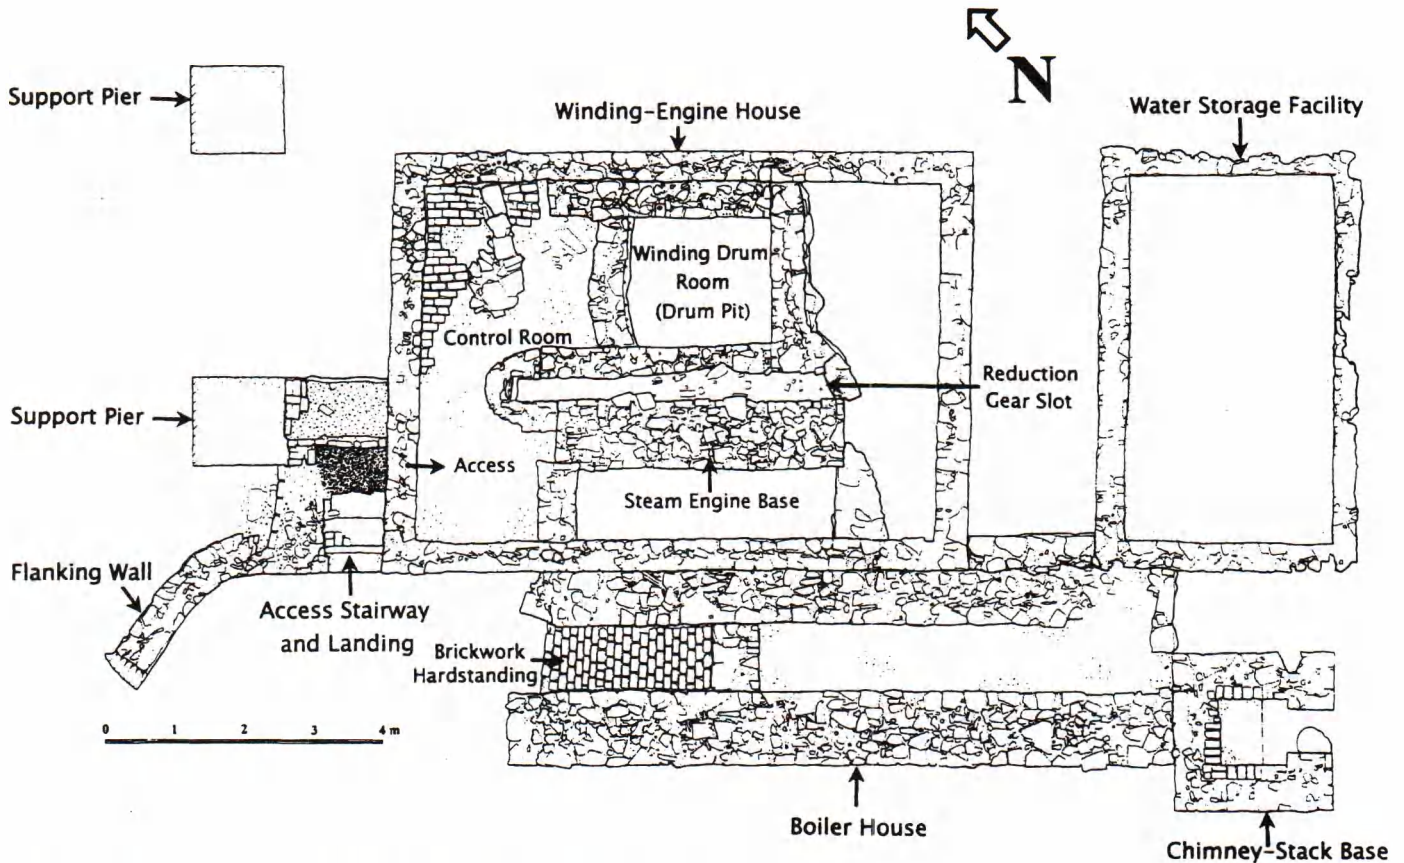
Plan of pit-head buildings, Land Pit, Church Farm, Mangotsfield.
